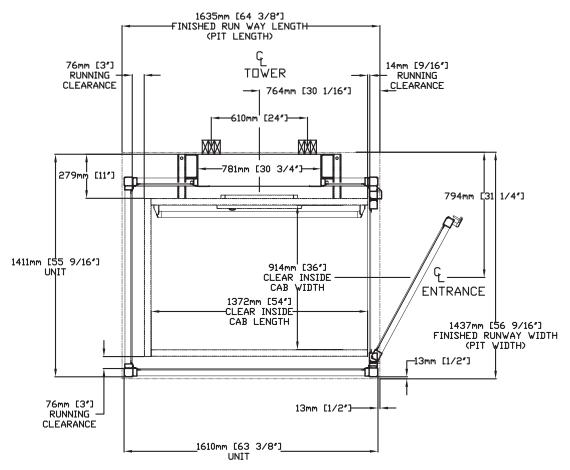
Plan View - Type 1R, 36" x 60" Cab, Hoistway Application
